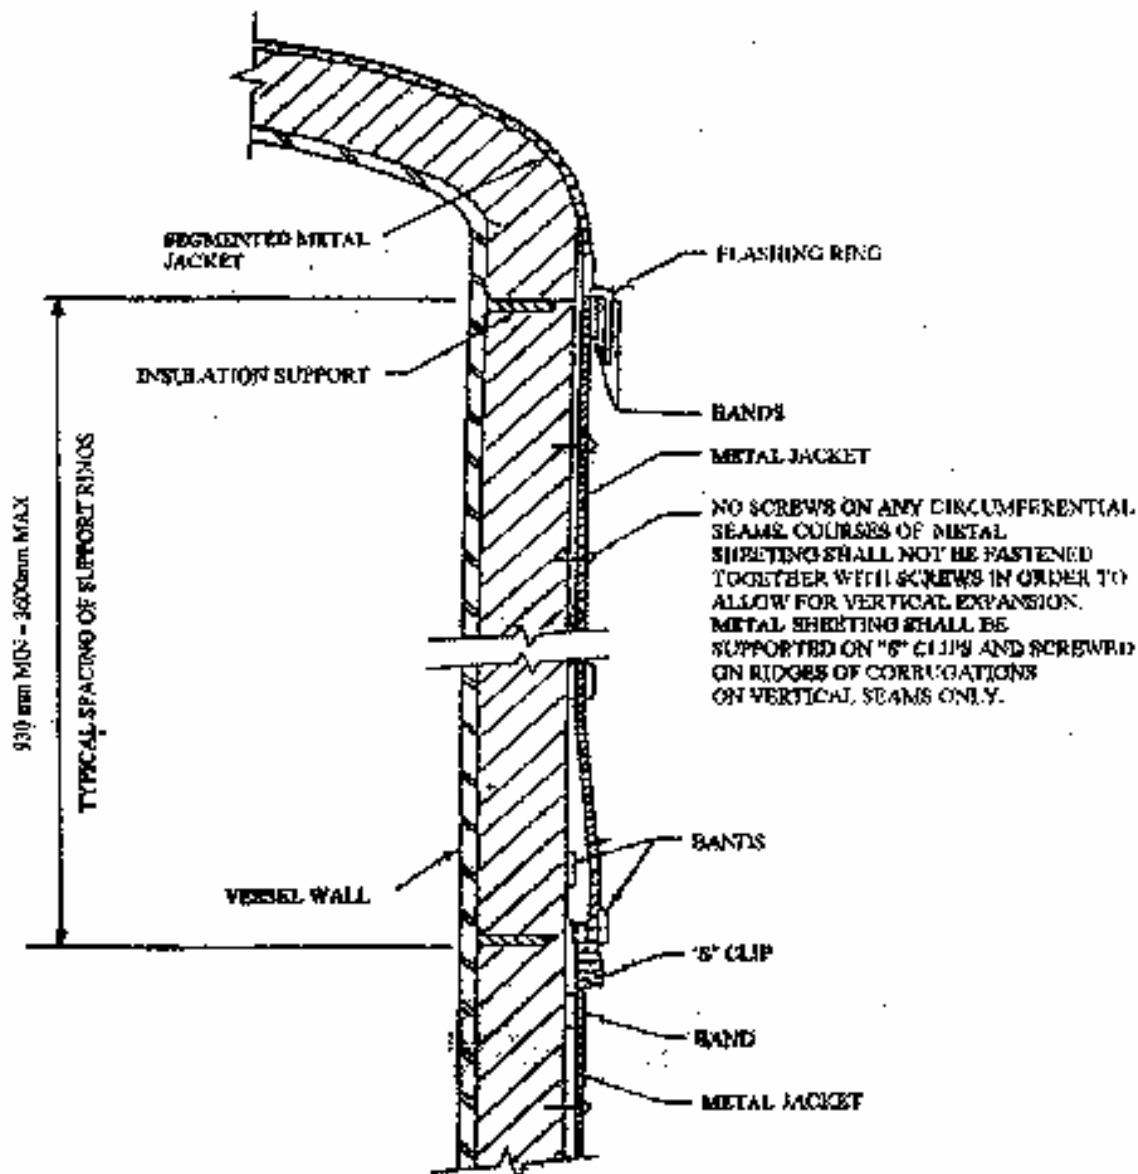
Vessel support, flashing and weatherproofing details – Class H insulation
